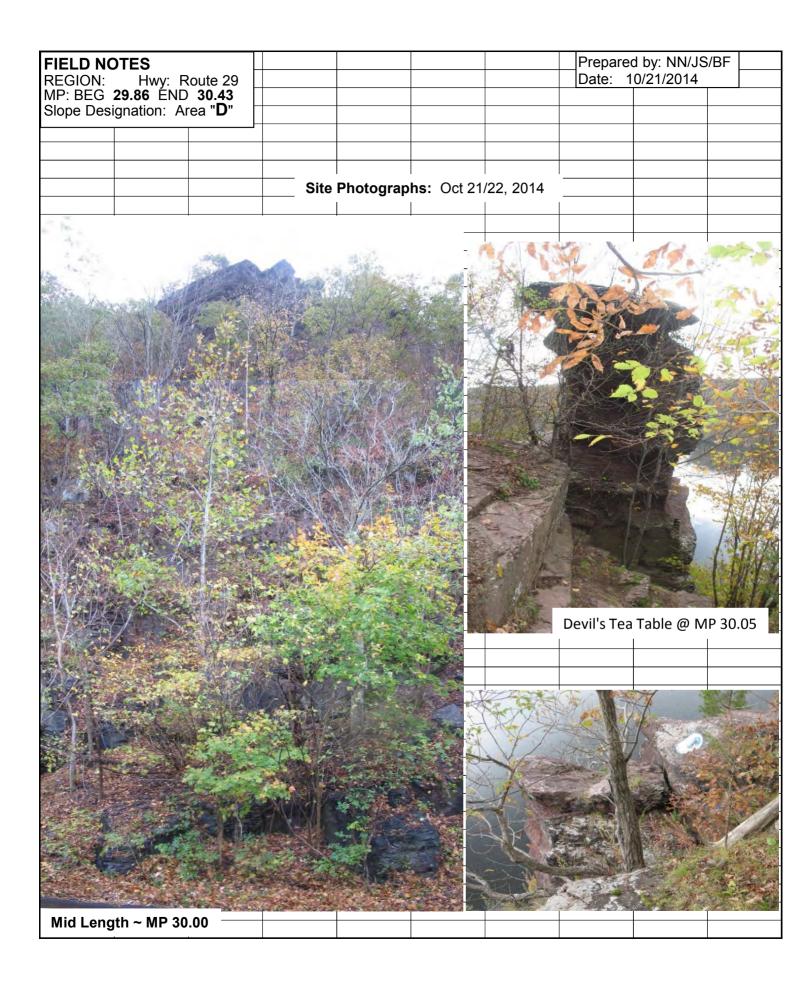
Differential weathering above Devil's Tea Table (Top of Slope, Area D, Looking Northeast)
